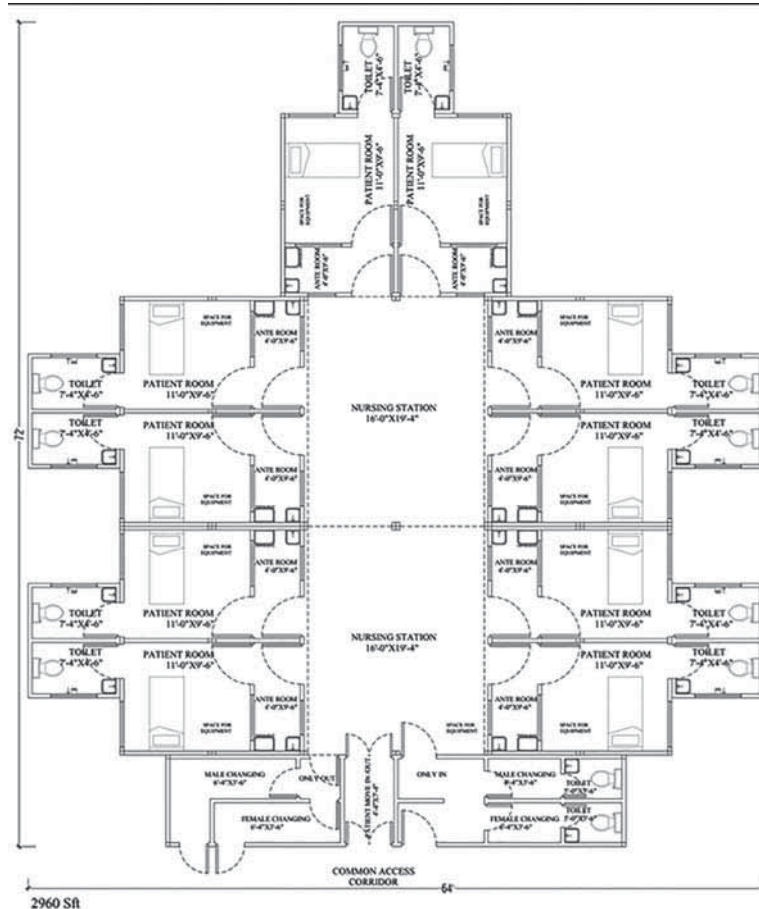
Architectural Plan for Single Module with Five Isolation Units of Ten Patients.
